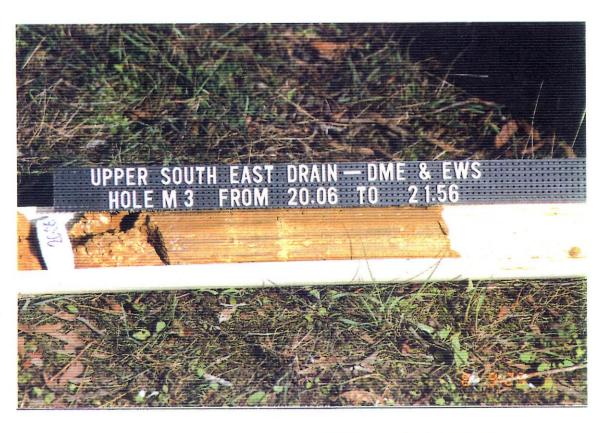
SITE 1, Borehole M3. Core sample from 20.06 m to 21.56 m depth Photo No 40299
